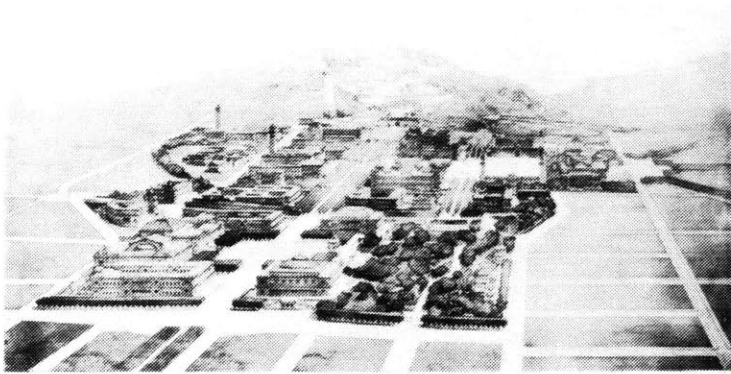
& 7: Architectural rendering of a building with a prominent tower and a large arched structure.
